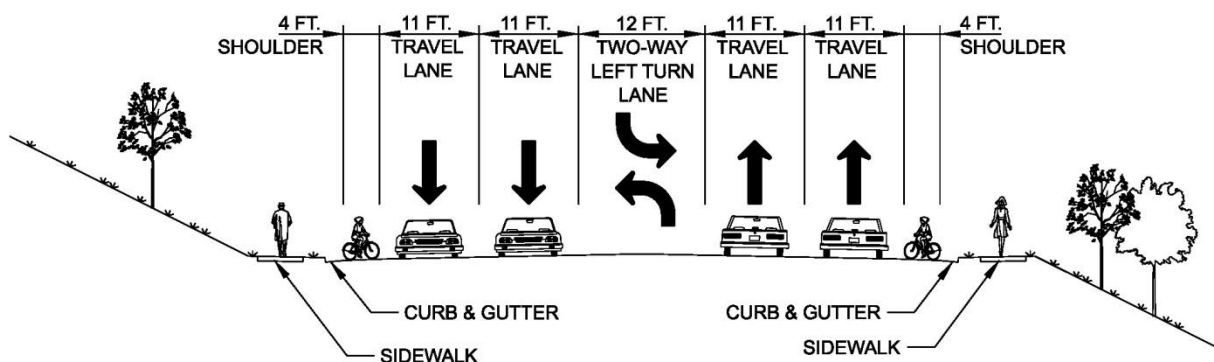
SEGMENT 1 PROPOSED TYPICAL SECTION
